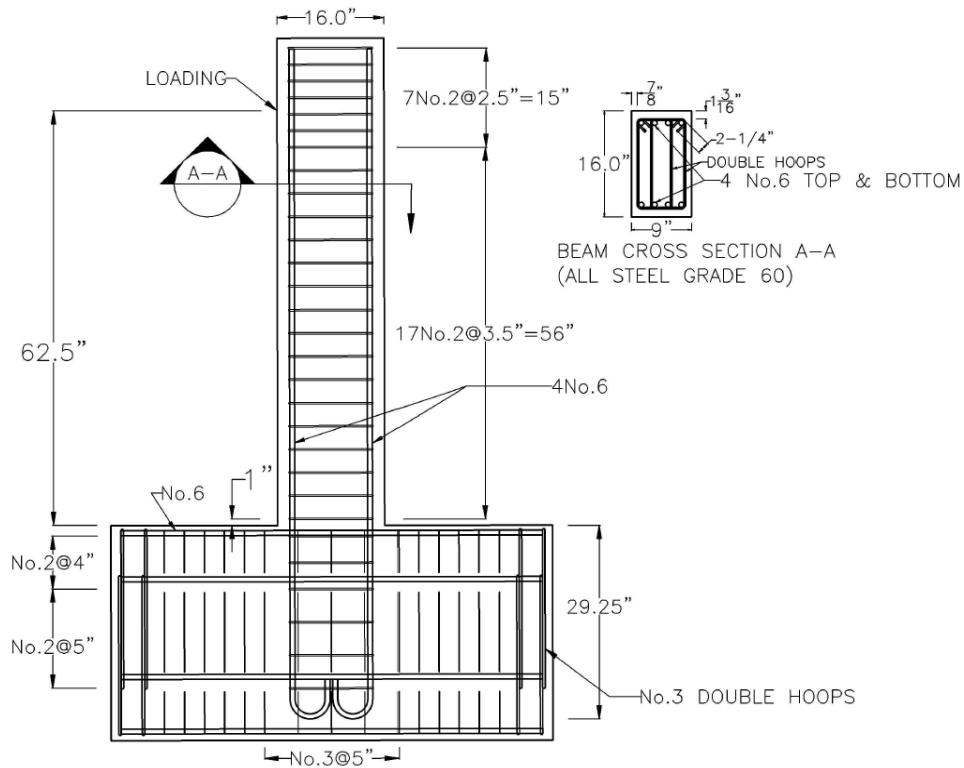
Reinforcement Details for Beam R-6 (Ma et al., 1976) (Drawing has been redone for clarity.)
